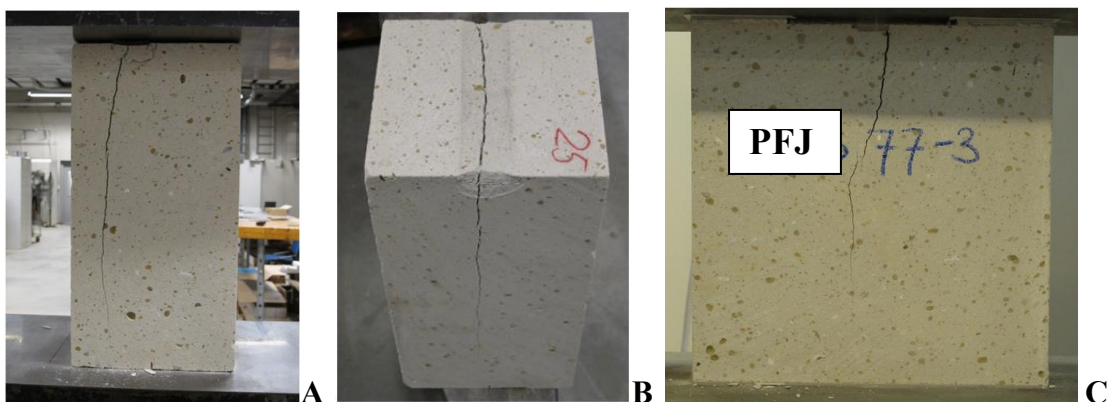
Splitting of specimens and traces of the centre strip after testing.
